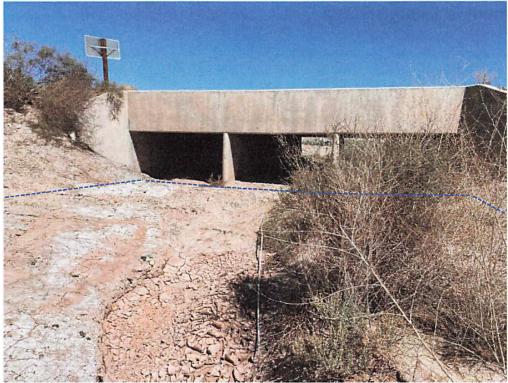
Imperial County, SR 111, PM 50.65 at Clay Wash. Culvert outlet downstream from the roadway, view north.
